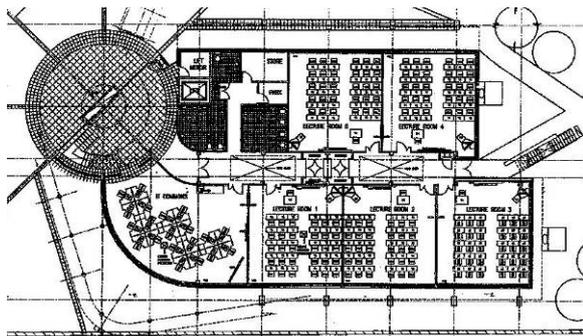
Ground Floor layout of building showing arrangement of lecture/seminar rooms and central corridor.
